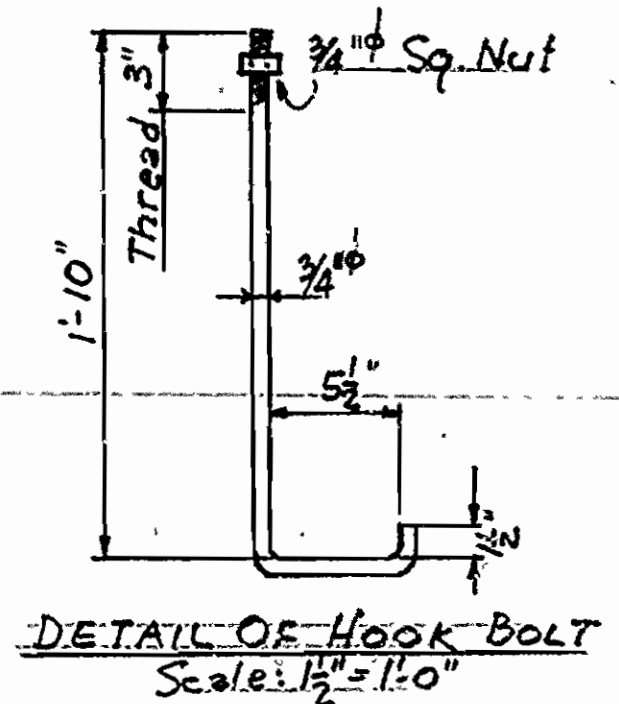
DETAILS OF RAIL POST CONNECTIONS ON TRUSS SPANS
